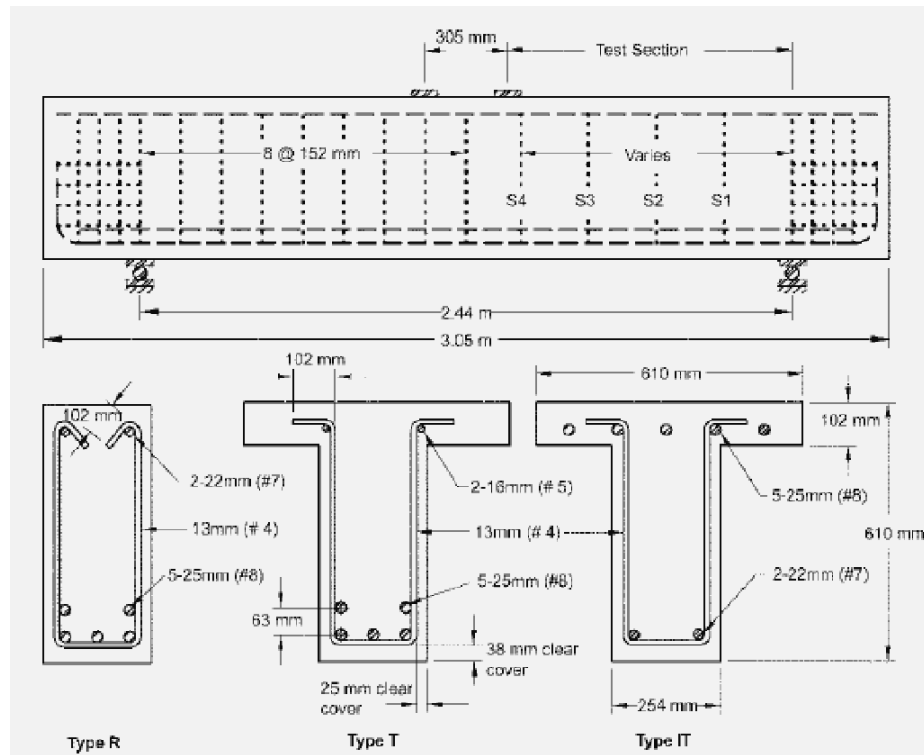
Specimen cross sections (Higgins and Farrow 2006)
